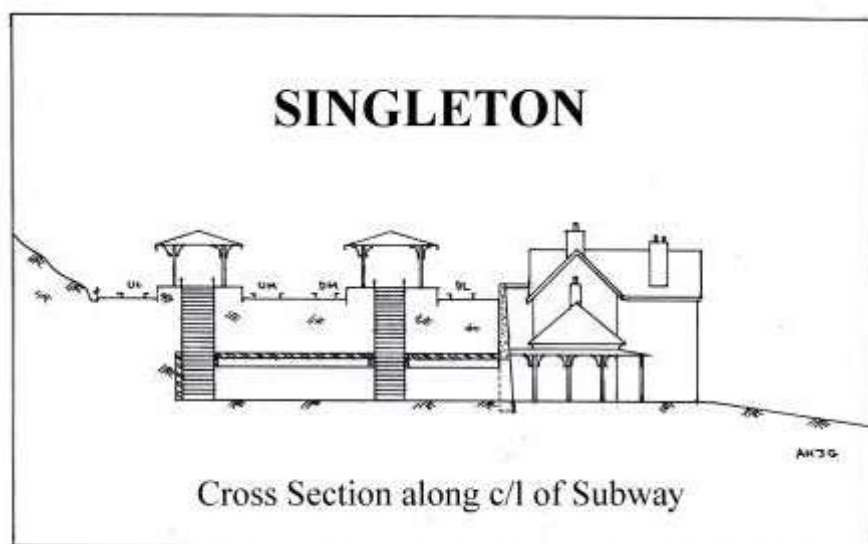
A cross-section through the station shewing how the difficult sloping site was accommodated by a massive retaining wall. The station buildings were linked to the platforms by a subway. (Author)
